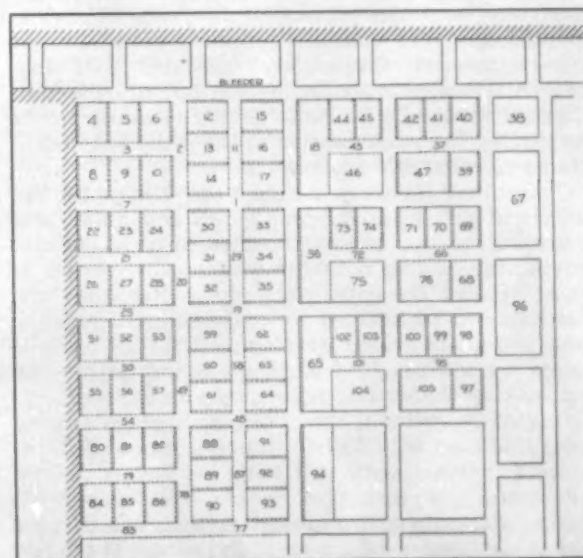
Consecutive numbers show sequence of driving rooms and pillars. Layout is planned to permit shifting loading points with least time loss.
